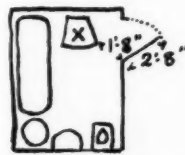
CHAIR X CRAMMED INTO BATHROOM BY HANGING DOOR TO OPEN OUT
